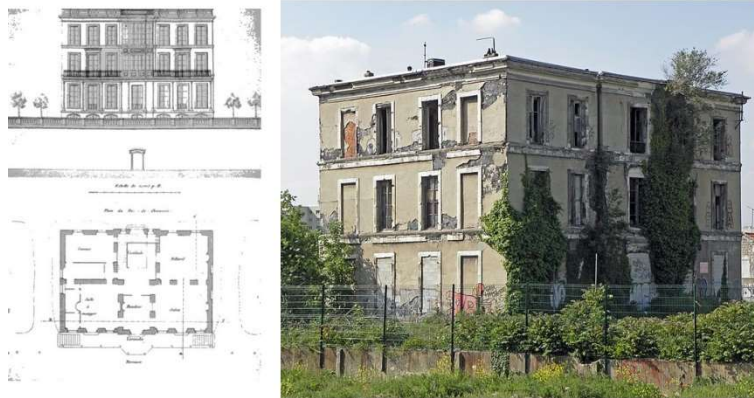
The world's first iron-reinforced concrete structure, a four-story house at 72 rue Charles Michels (6)
